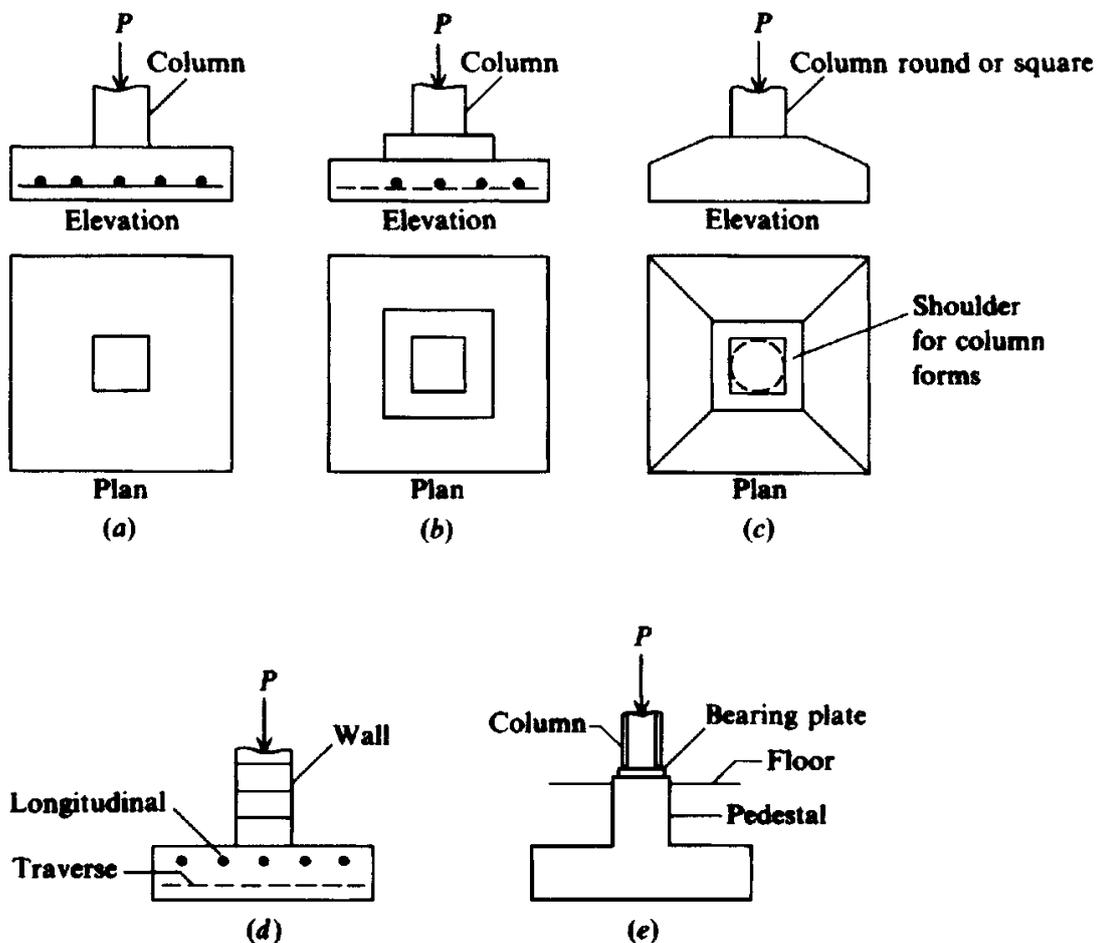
Typical footings, (a) Single or spread footings; (b) stepped footing; (c) sloped footing; (d) wall footing; (e) footing with pedestal.
